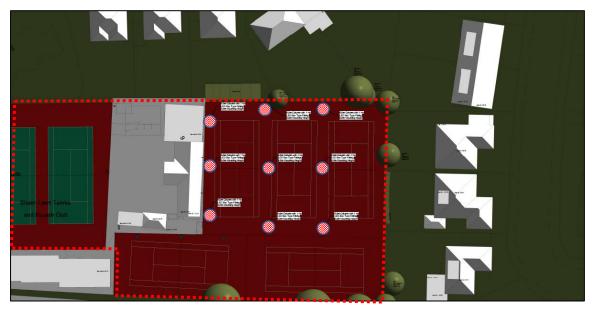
Proposed site plans (Image Source: Sports Facility Planning and Design Ltd)
